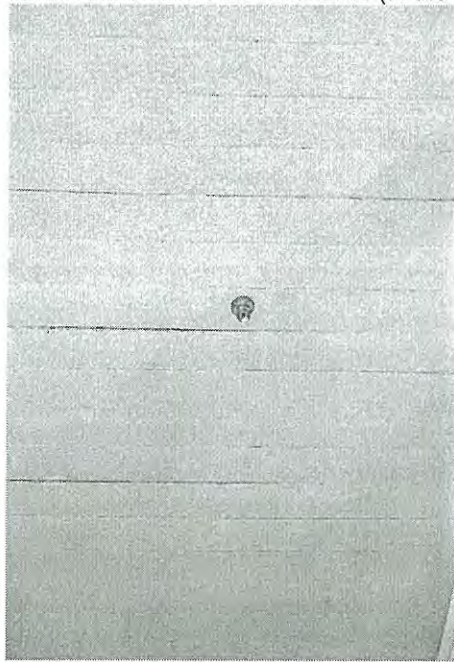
Interior, Landing & Stairs (space FF12). Detail of early v jointed timber lining board ceiling.
